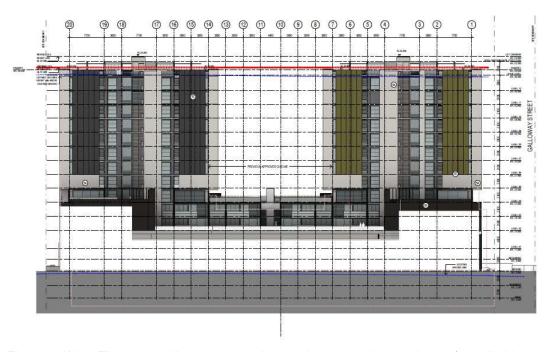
West Elevation, with the proposed amendments marked up in red (supplied by applicant)
